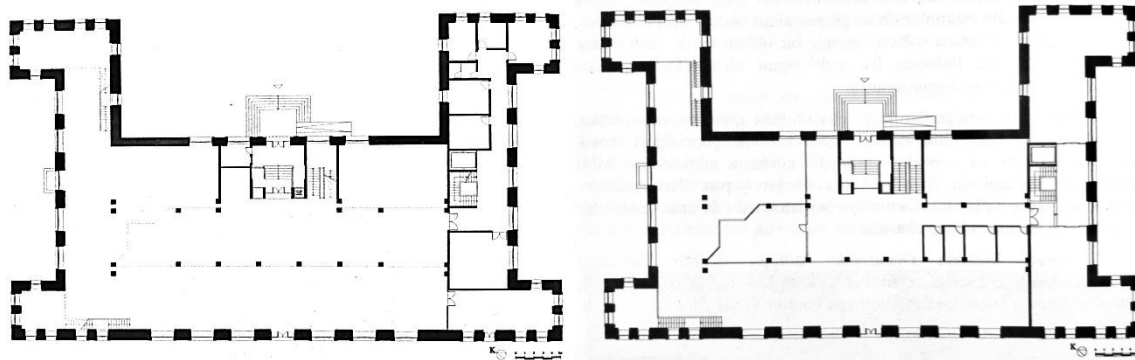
Sivas Archaeological Museum Ground Floor and Upper Floor Plan (Bulut, 2019)
